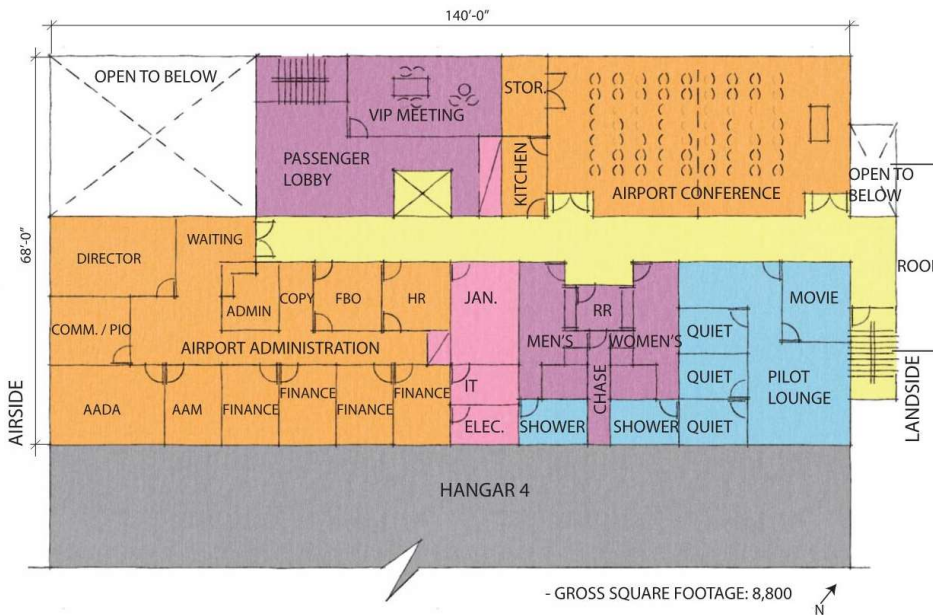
Preferred Concept – FBO Terminal Second Floor Plan
